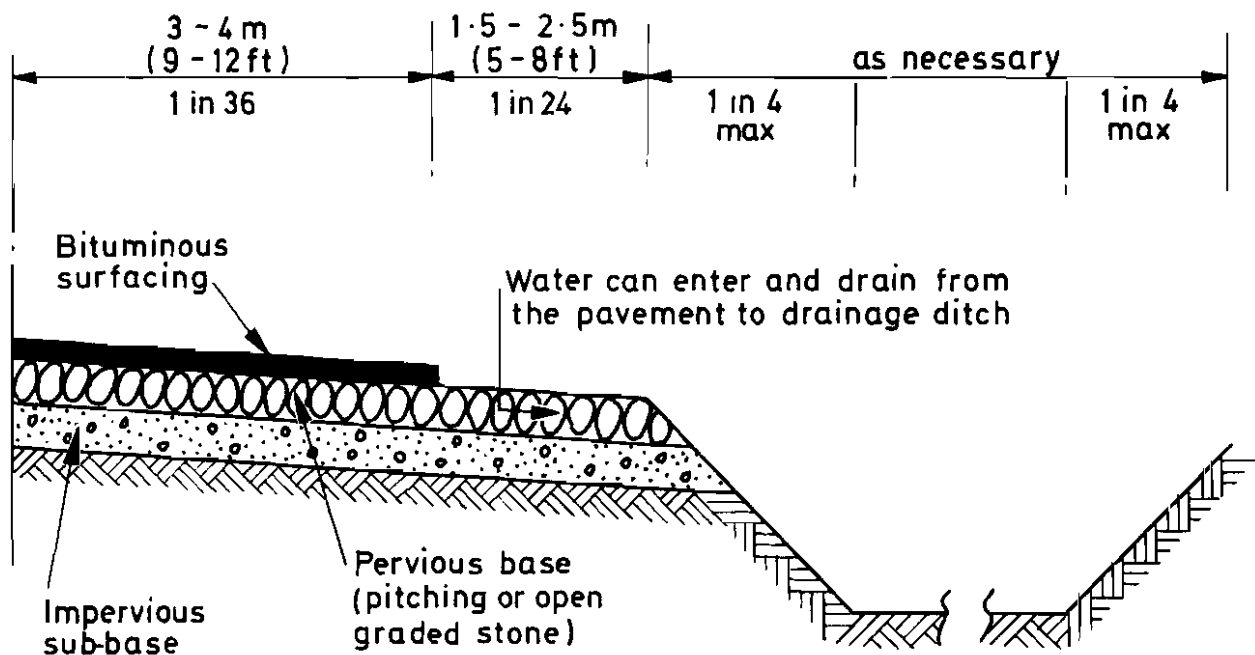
DRAINAGE OF PAVEMENT LAYERS WHEN THE BASE IS PERVIOUS
